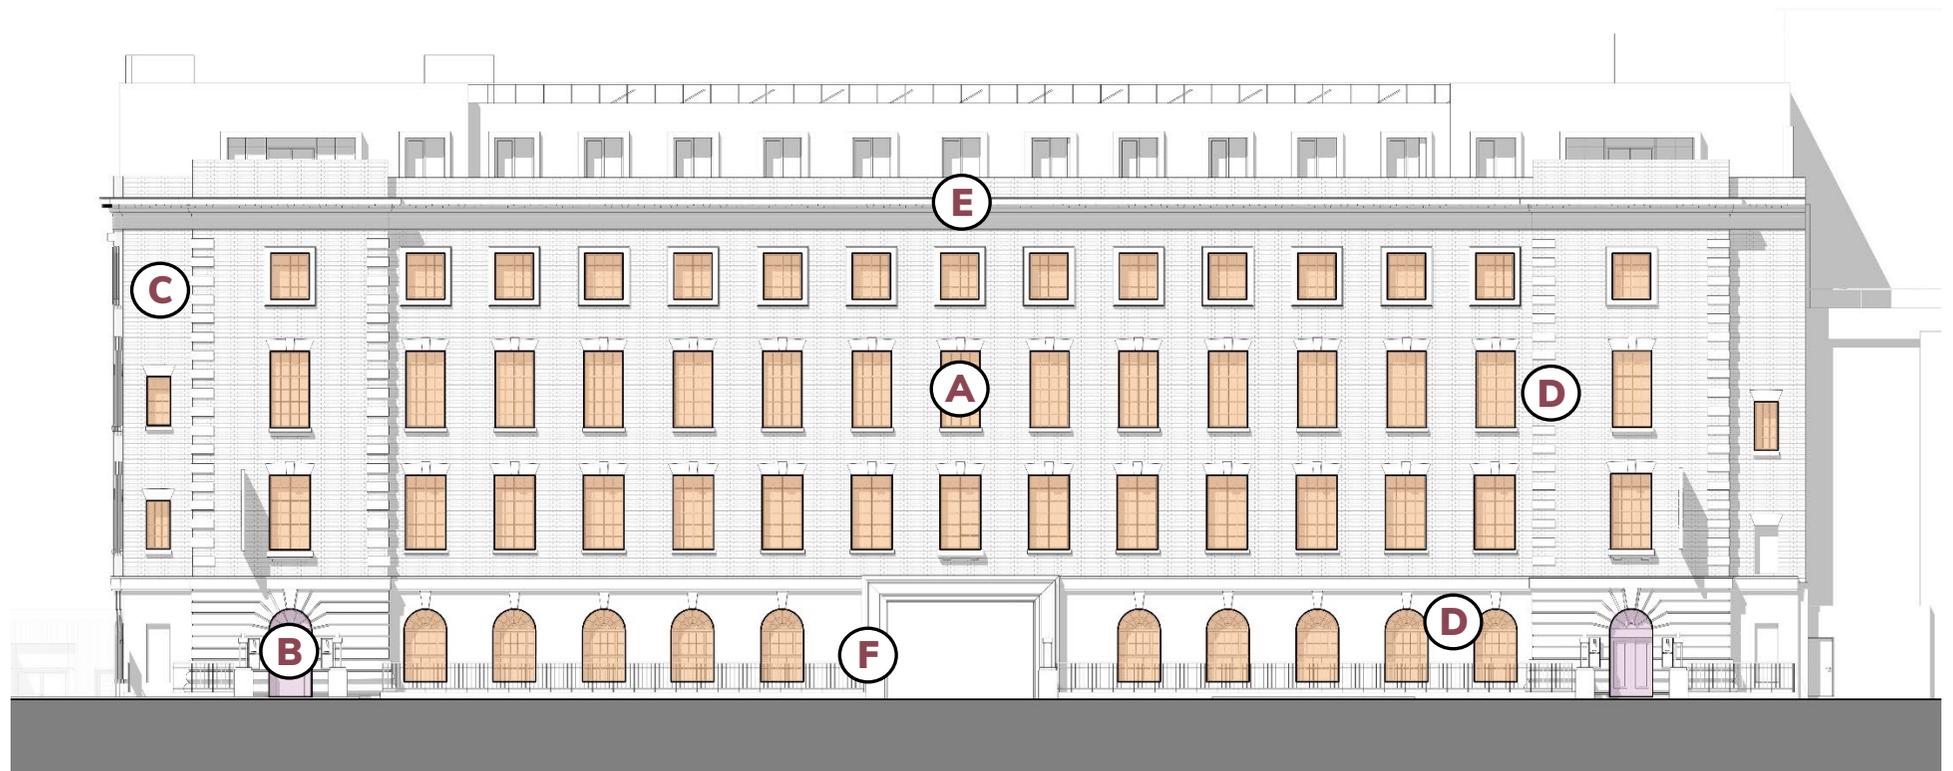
Proposed Restoration, Edward Street Façade, Sorting Office
